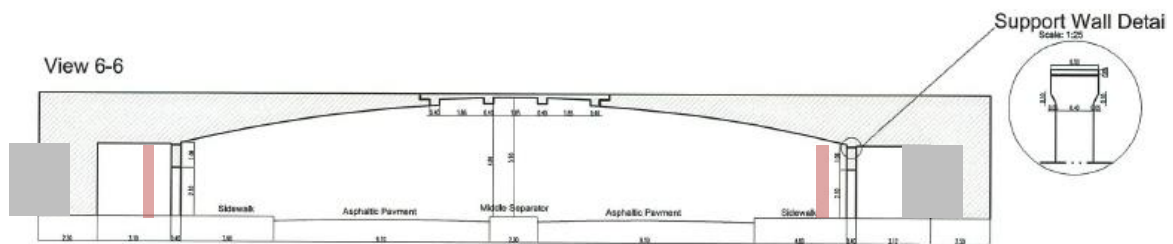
Disposition of exterior (brown) and interior walls of bridge (gray) (section 6-6)
